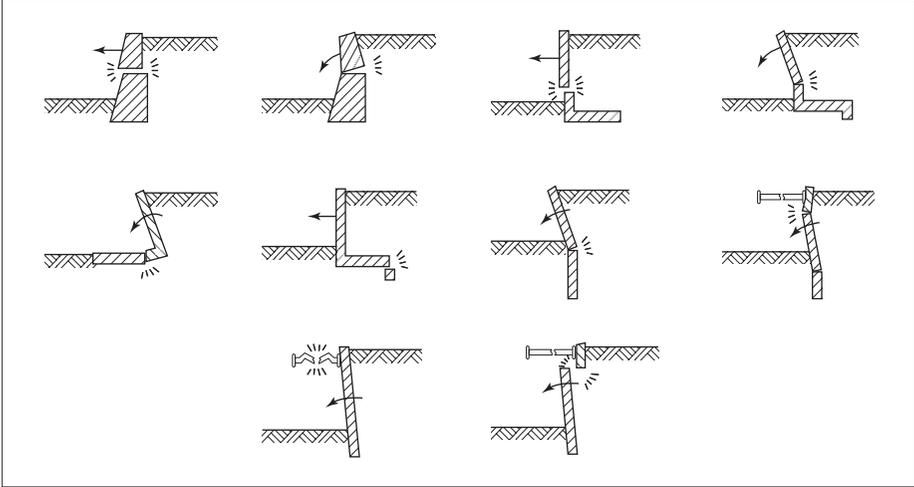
Examples of limit modes for structural failure (after Section 9.7.6 EC7 Part 1)
